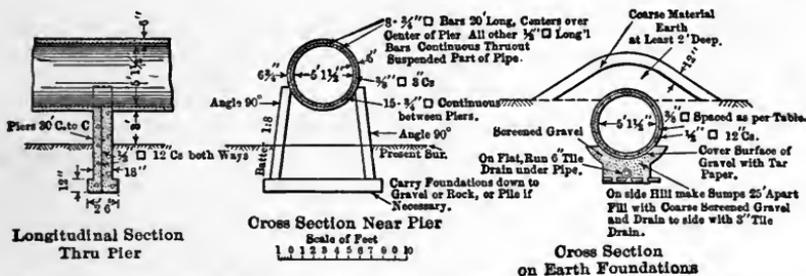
Sections of reinforced concrete pipe of Simms Creek Siphon. Sun River Project, Mont.
